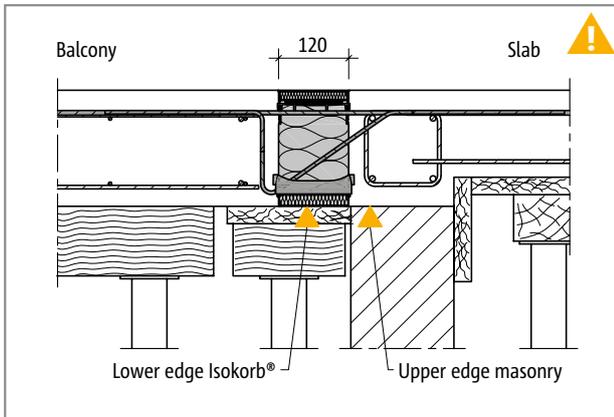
Schöck Isokorb® XT type K: In-situ concrete balcony with height offset floor on masonry wall
